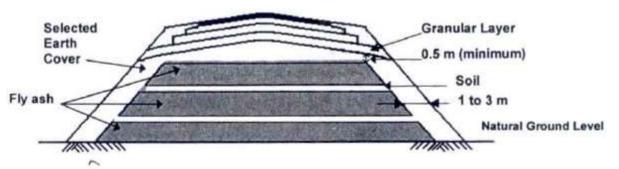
Typical Cross section of embankment with alternate layer of fly ash and soil
